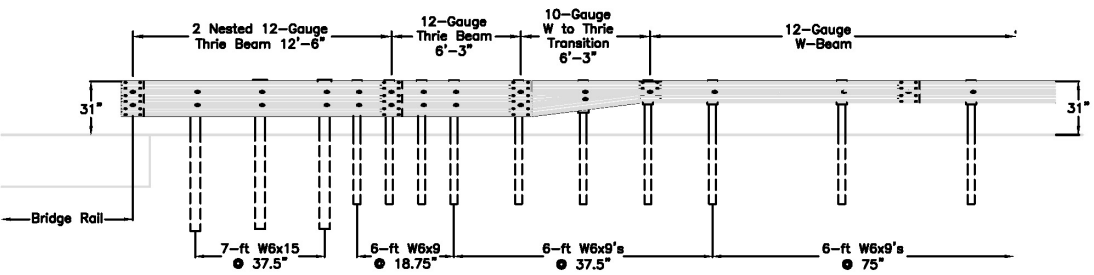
Attachment to Transition to Thrie Beam & Tube Bridge Rail, STTR Testing Series [17-20]
